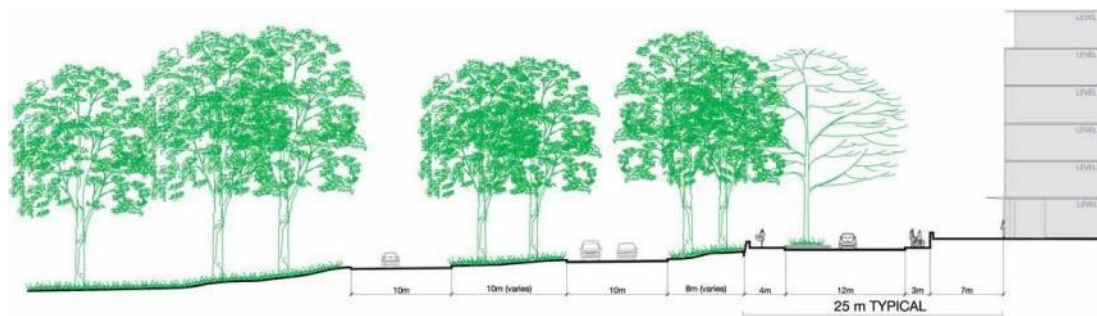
Constitution Avenue and Anzac Parade – Indicative streetscape design
